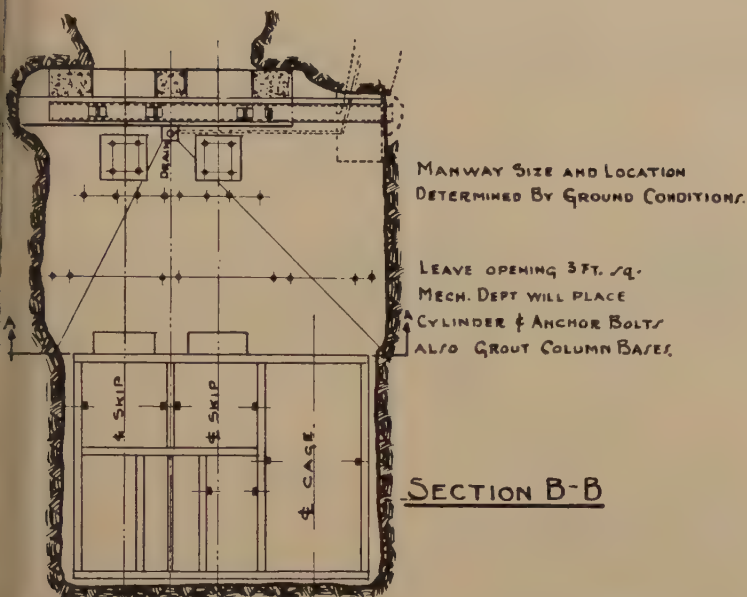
EXCAVATION FOR SKIP-LOADING POCKET.
